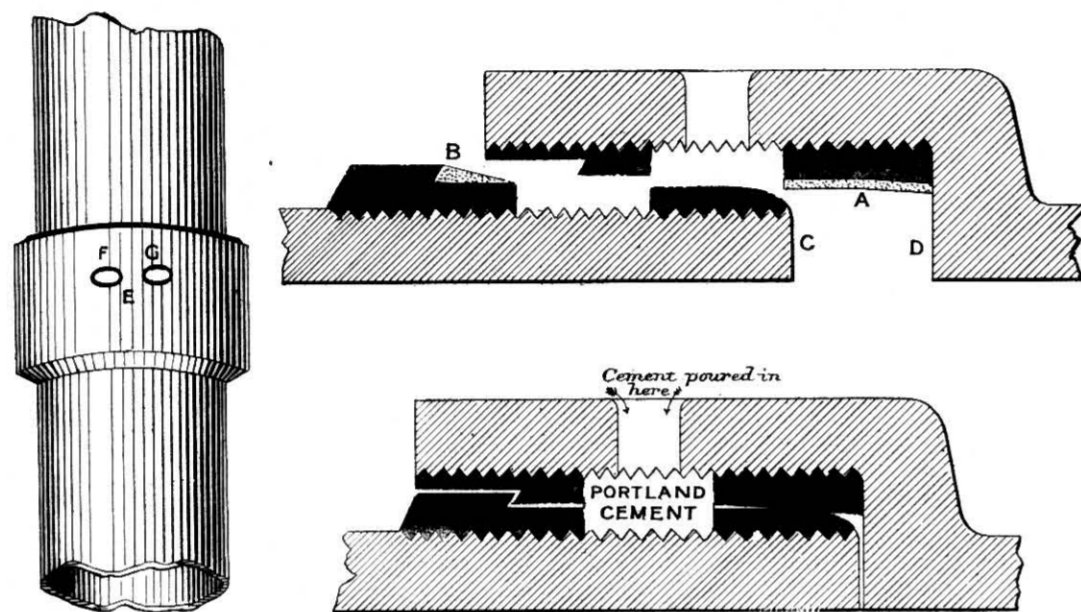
Hassall's Double-lined Drain-pipe Joint.
